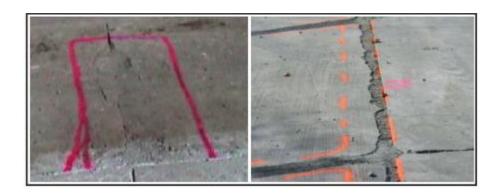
Photo. Deteriorated Pavement Marked for Sawing (Frentress et al., 2012)
